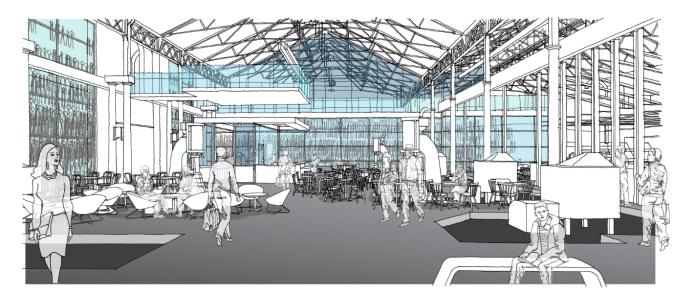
Artistic Impression of Bay 2 retail area and loading dock wall
